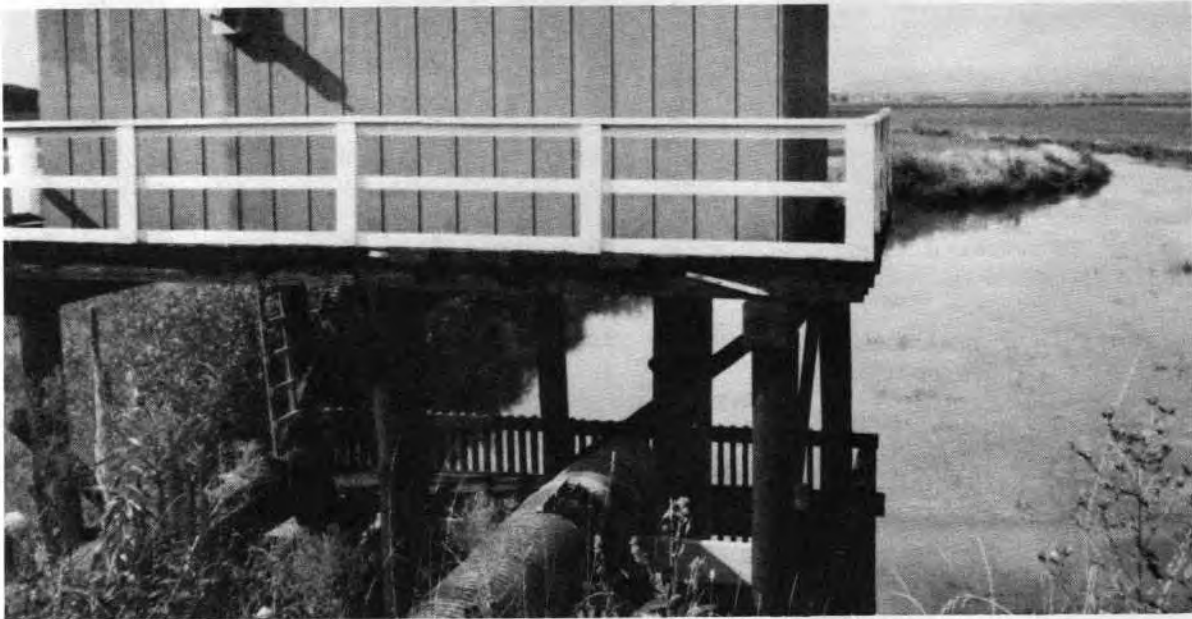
View of pumping station on a drainage slough leading into the North Fork of the Skagit River.
